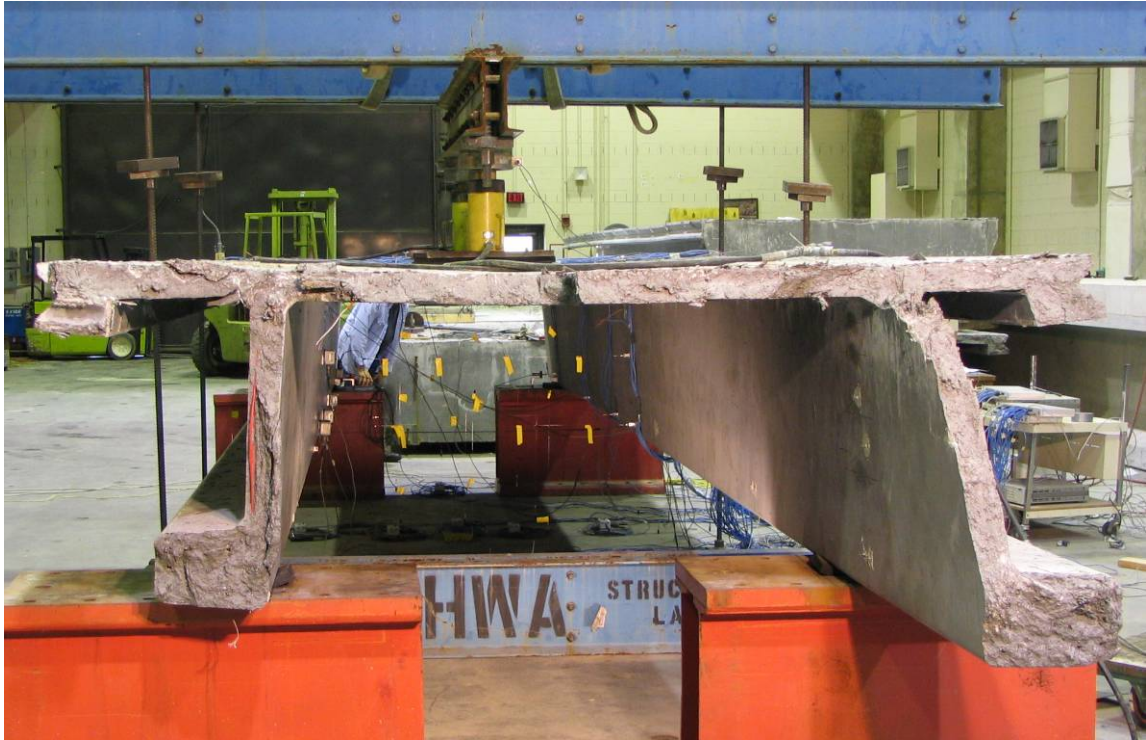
Photo. Girder P4-24T east elevation view at peak applied load.
